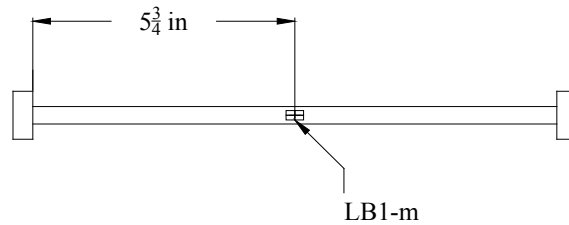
Reinforcement layout in transverse joint (tension) specimen
